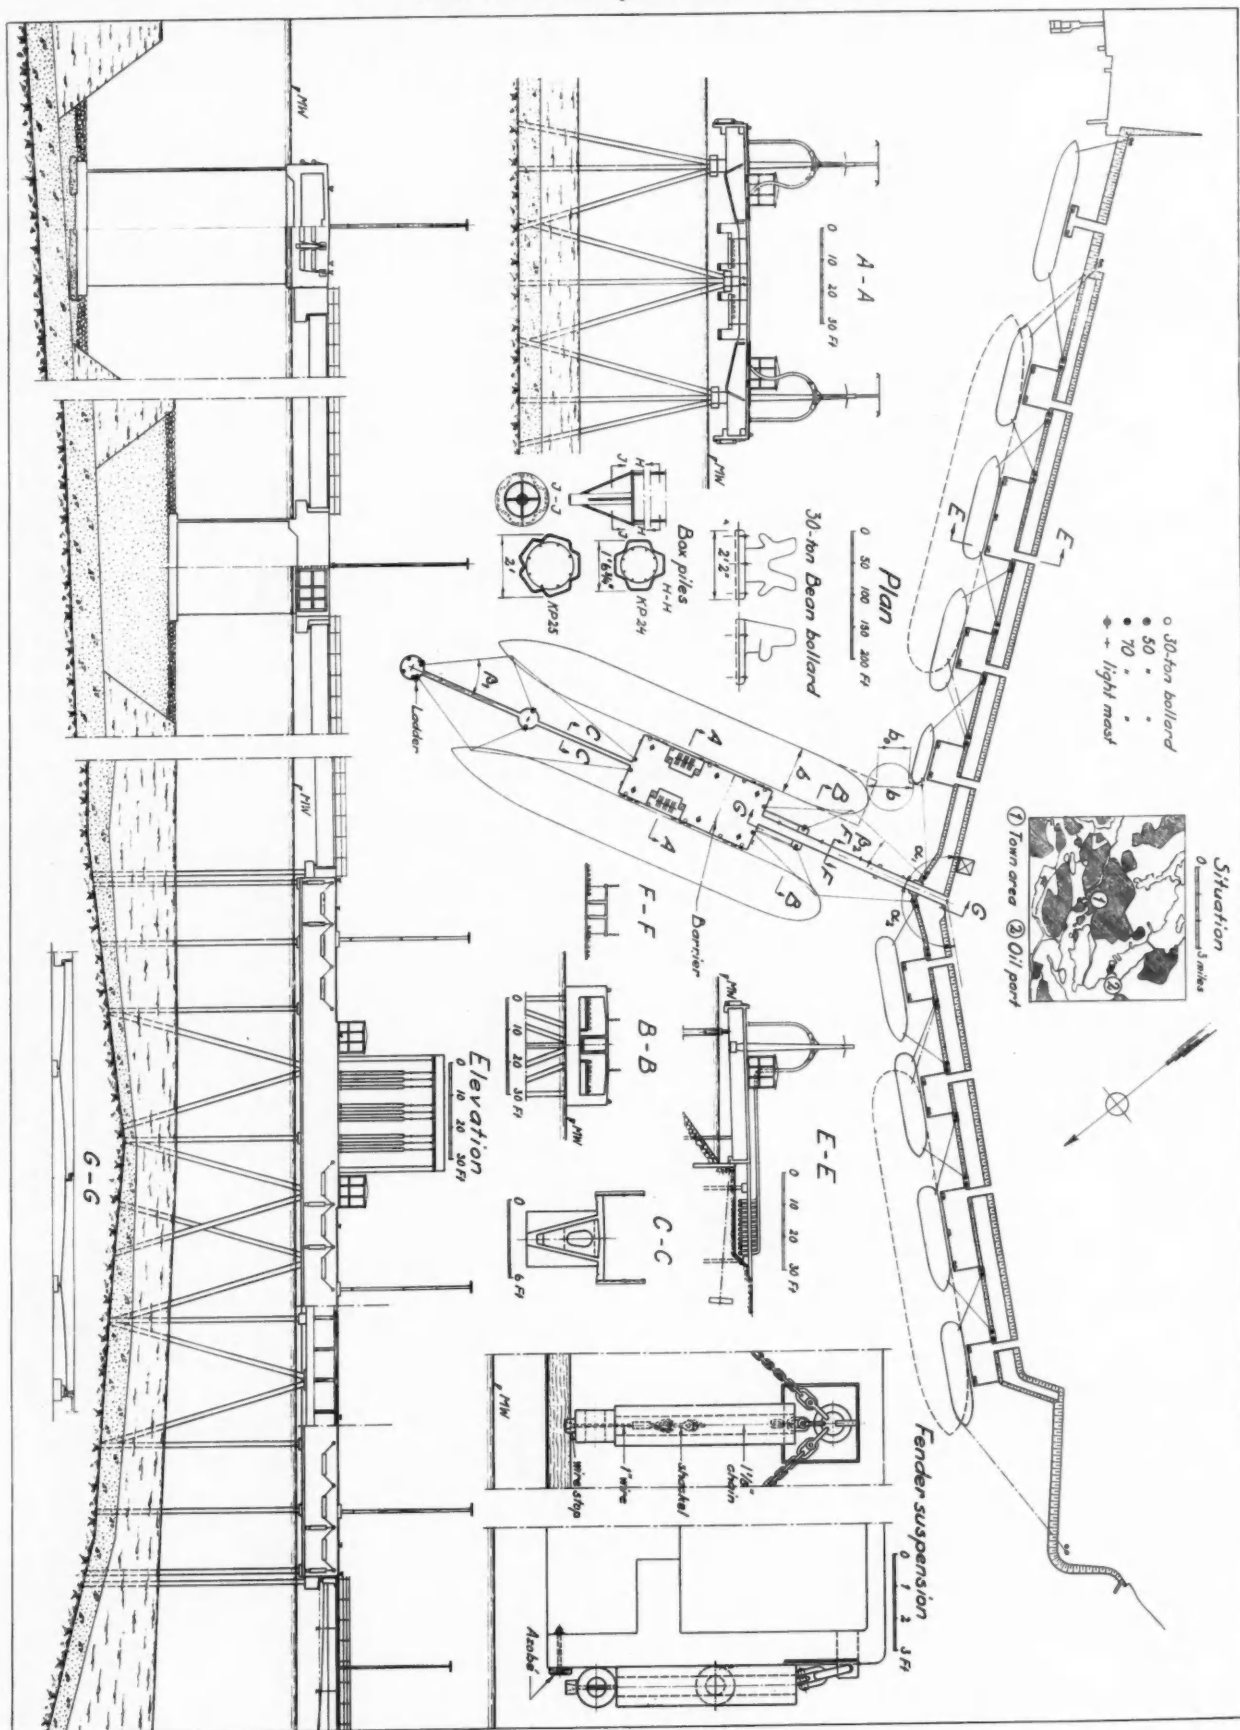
The Oil Port of Stockholm—Site plan and details.
